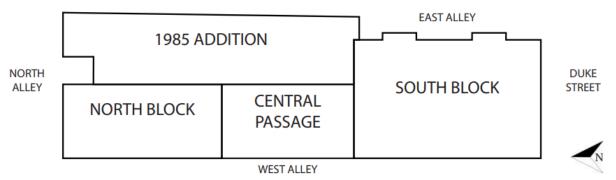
B-1: Key Plan of Freedom House, including South Block, North Block, Central Passage, and 1985 Addition.
